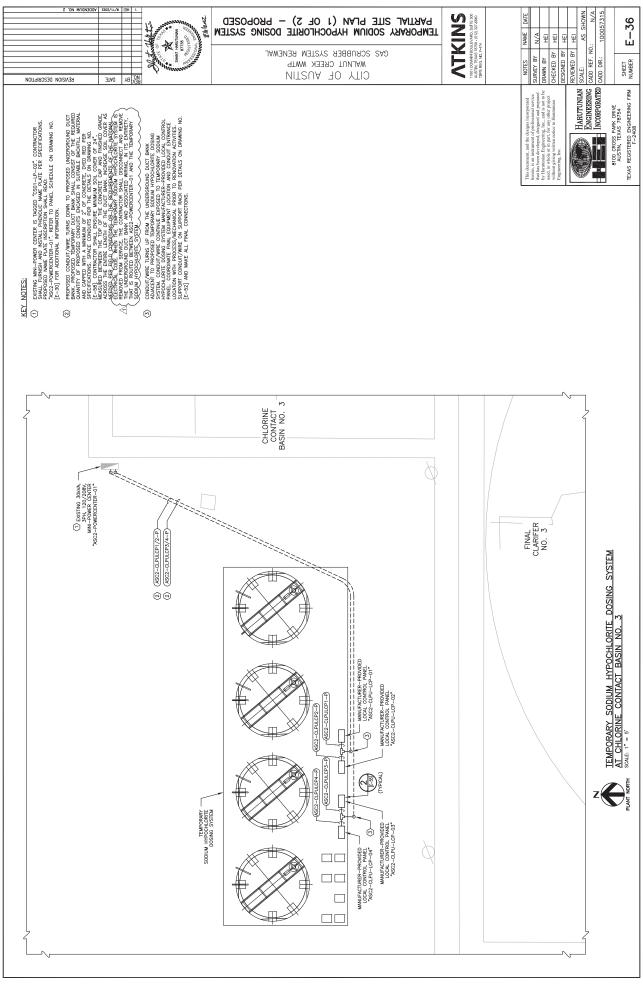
, Sheet 61 of 83 REMOVE in its entirety and REPLACE with the attached.
